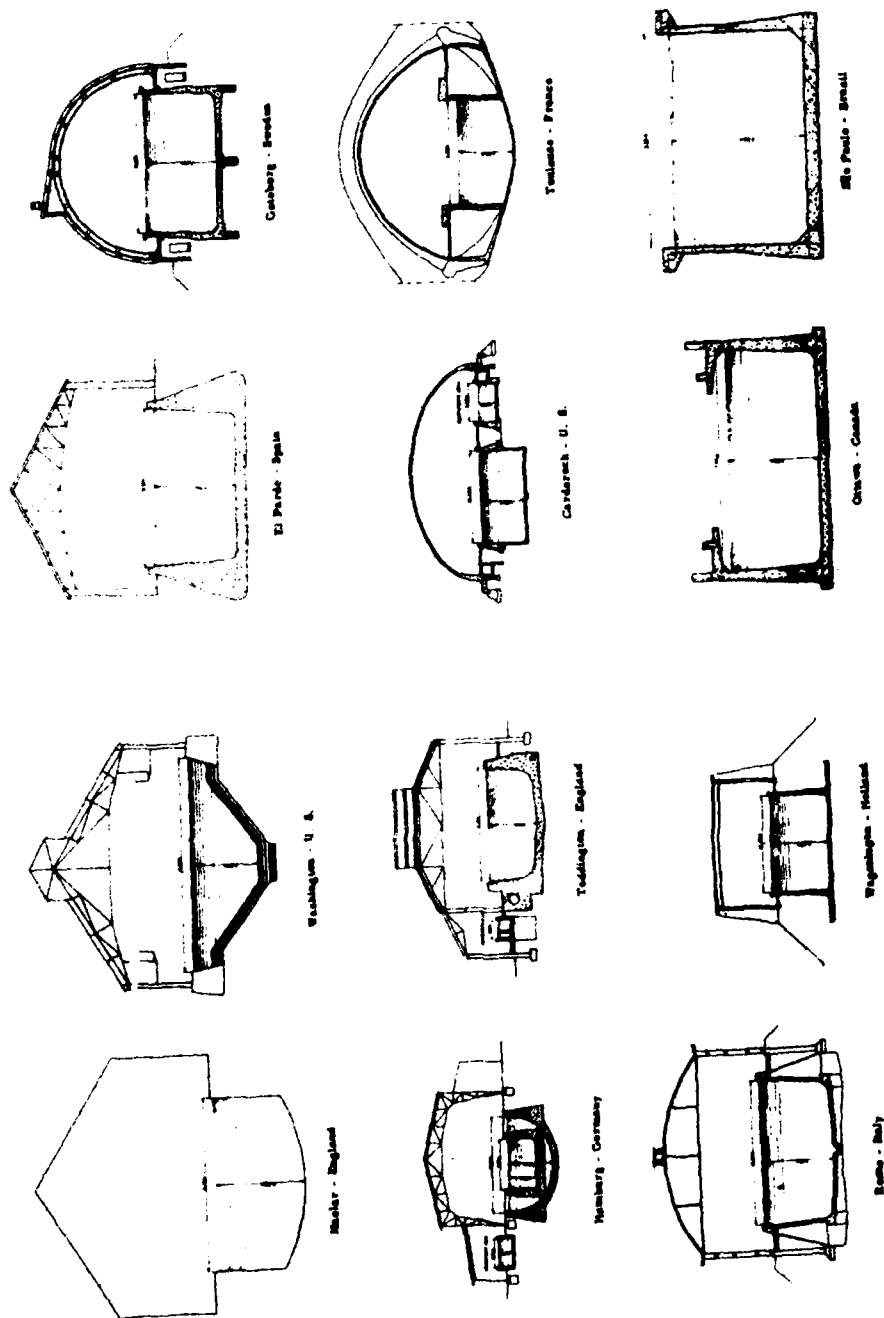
TOWING - TANK FACILITIES IN CROSS SECTION (ref.15)
